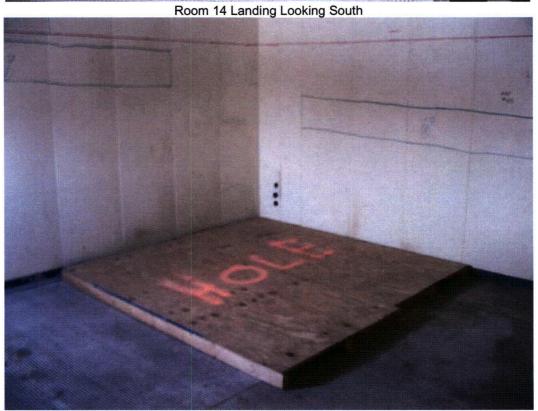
, SEB Mezzanine (2nd Fl.) Office Rooms (Survey Unit Se-2-4)
